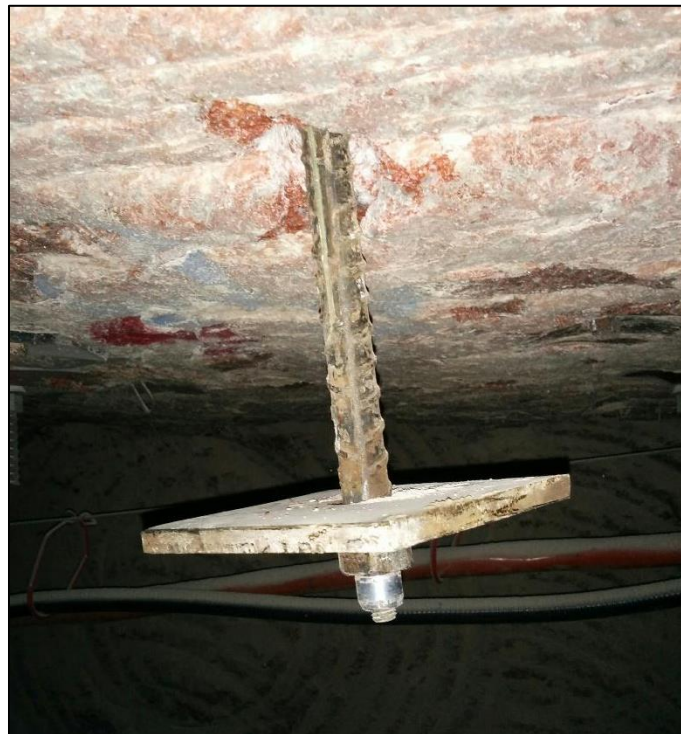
Installed instrumented rebar at Nutrien Allan
